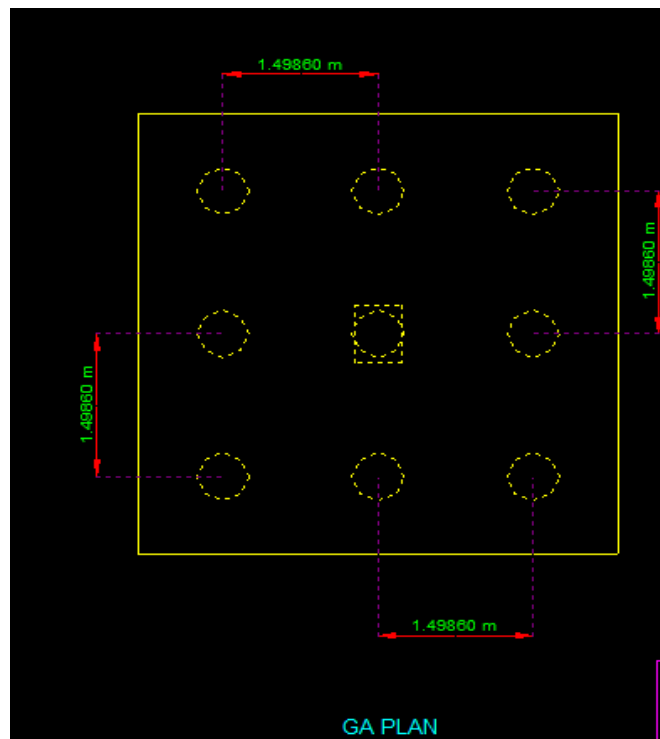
Plan of pile group in STAAD.FOUNDATION
